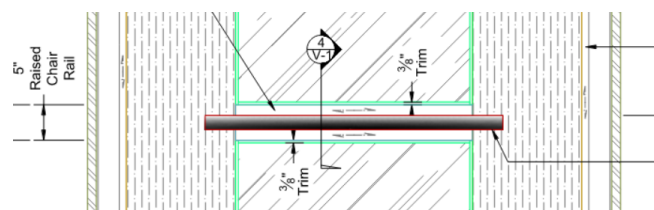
Incorrect shop-drawing plan detail showing chair-rail/handrail fastener conflict (illustrative and de-identified).
